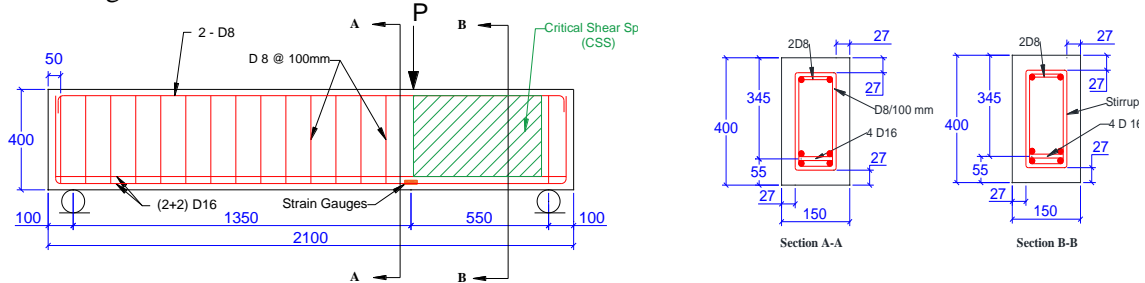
Longitudinal and cross-section of the beam specimens (Dimensions in mm).
